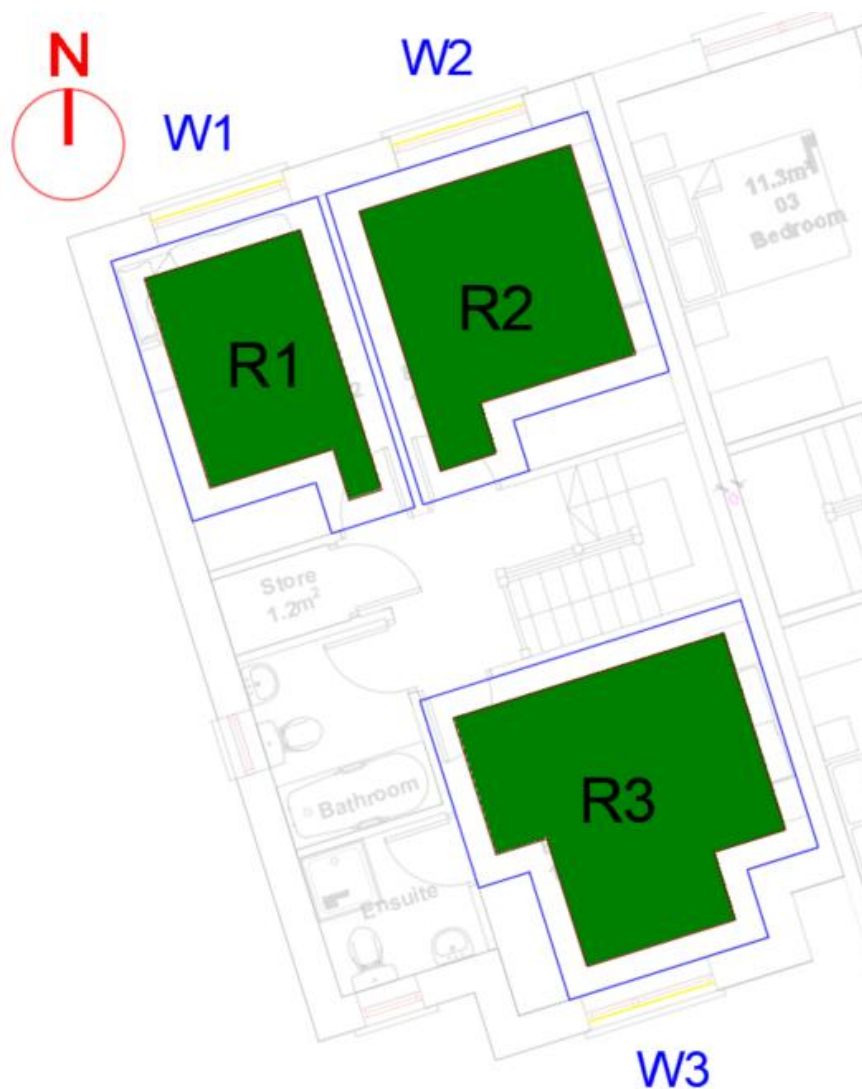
Proposed First Floor sDA Contours of House D-03 3-064
